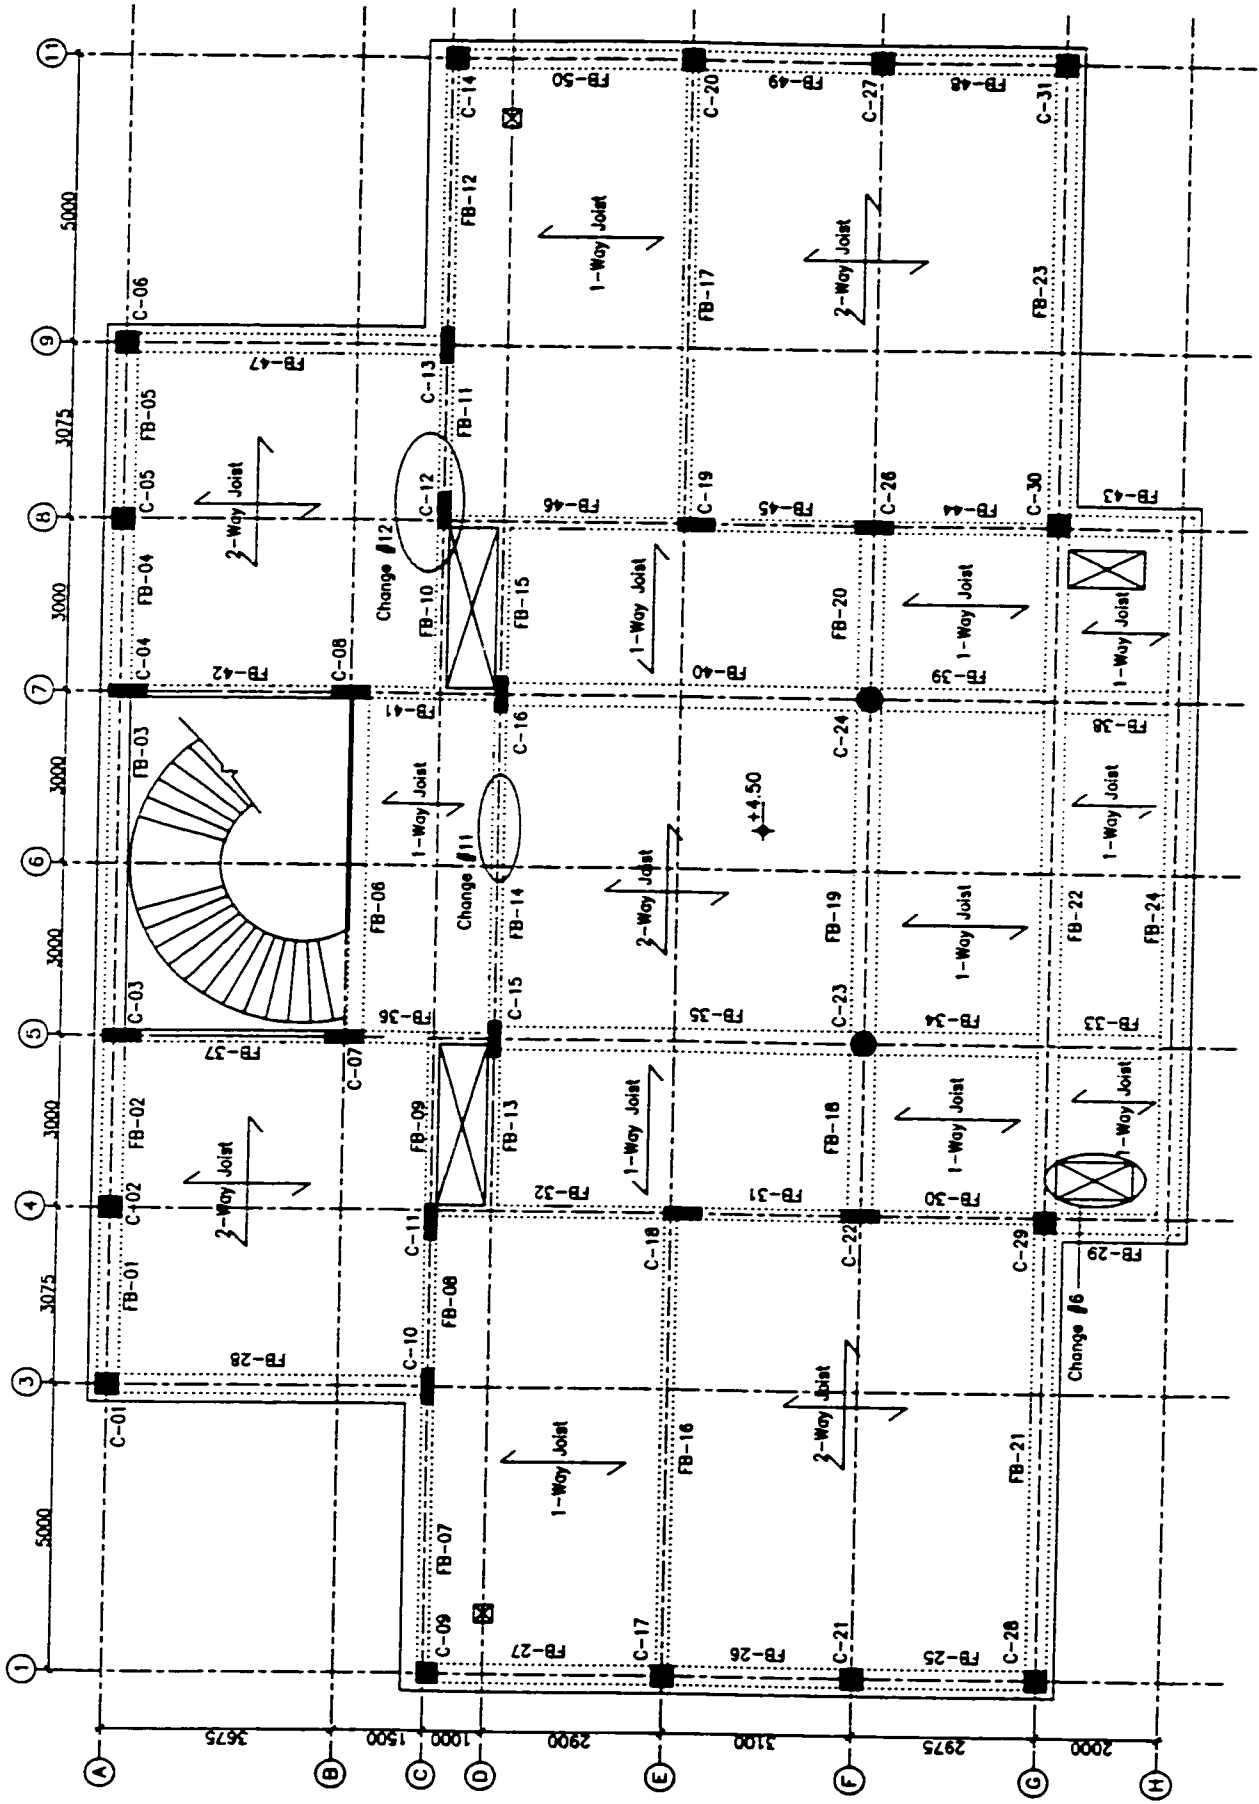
First Floor Structural Framing Plan of the Case Study Building.
